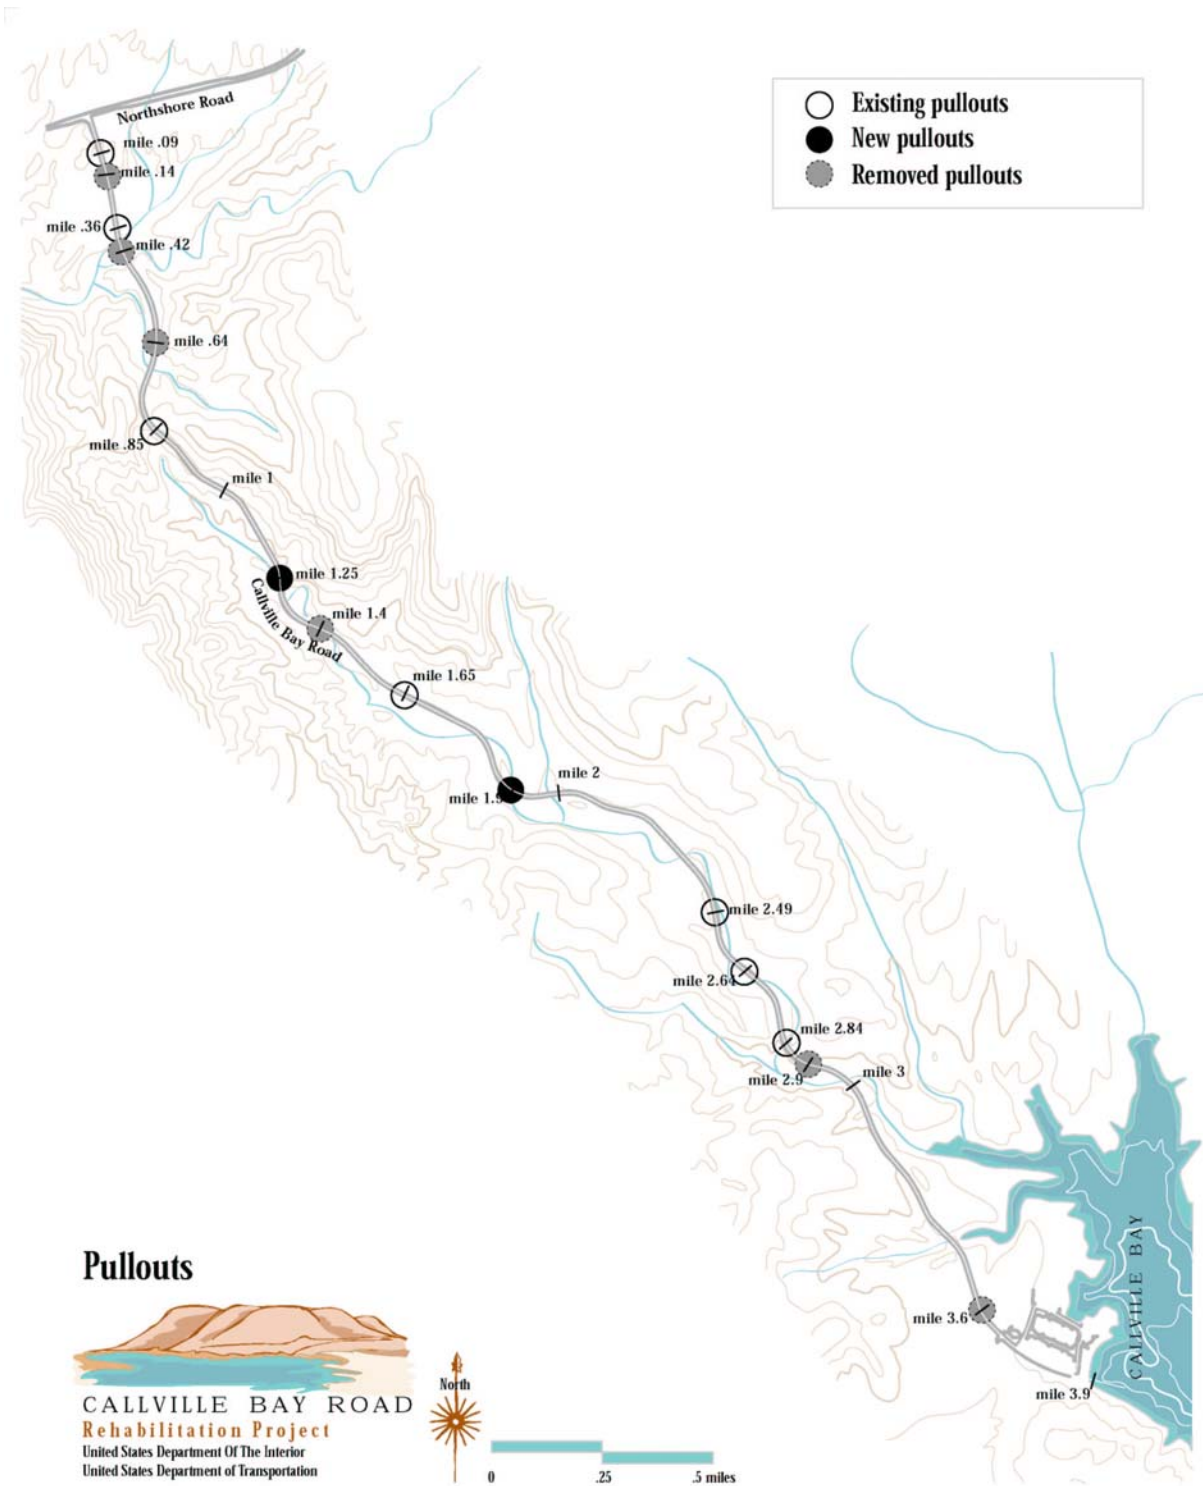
PULLOUTS ON CALLVILLE BAY ROAD
